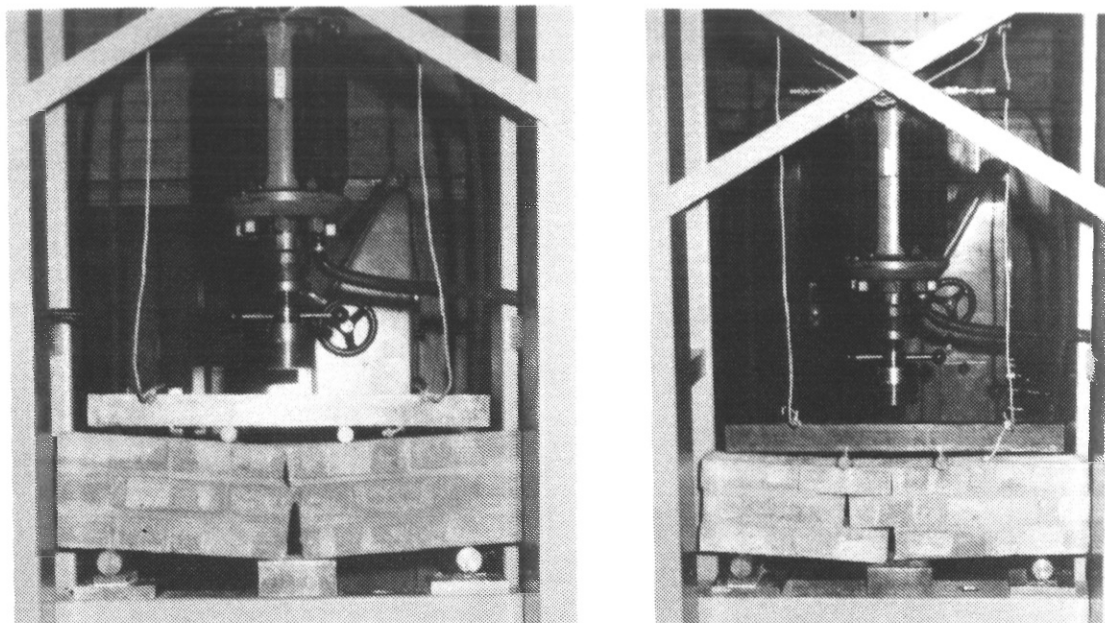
Typical testing of brickwork wallets in indirect tension.
